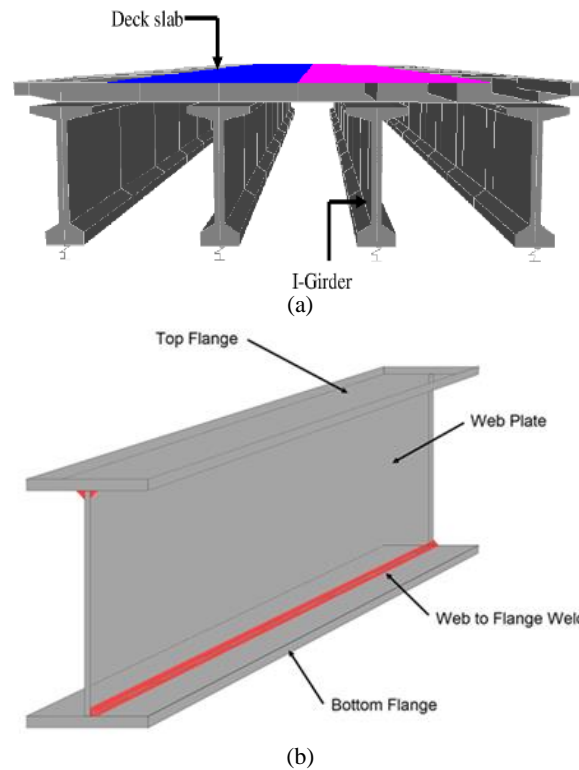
(a) Prestress concrete girder and (b) Steel plate girder
